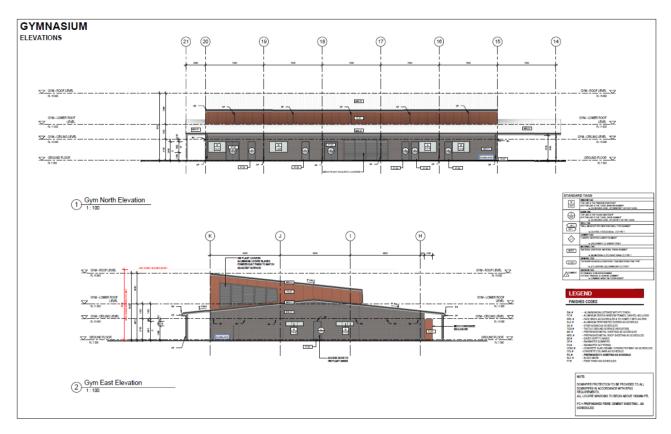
Elevation plan of gymnasium, Source: EJE, dated: 14 April 2023
